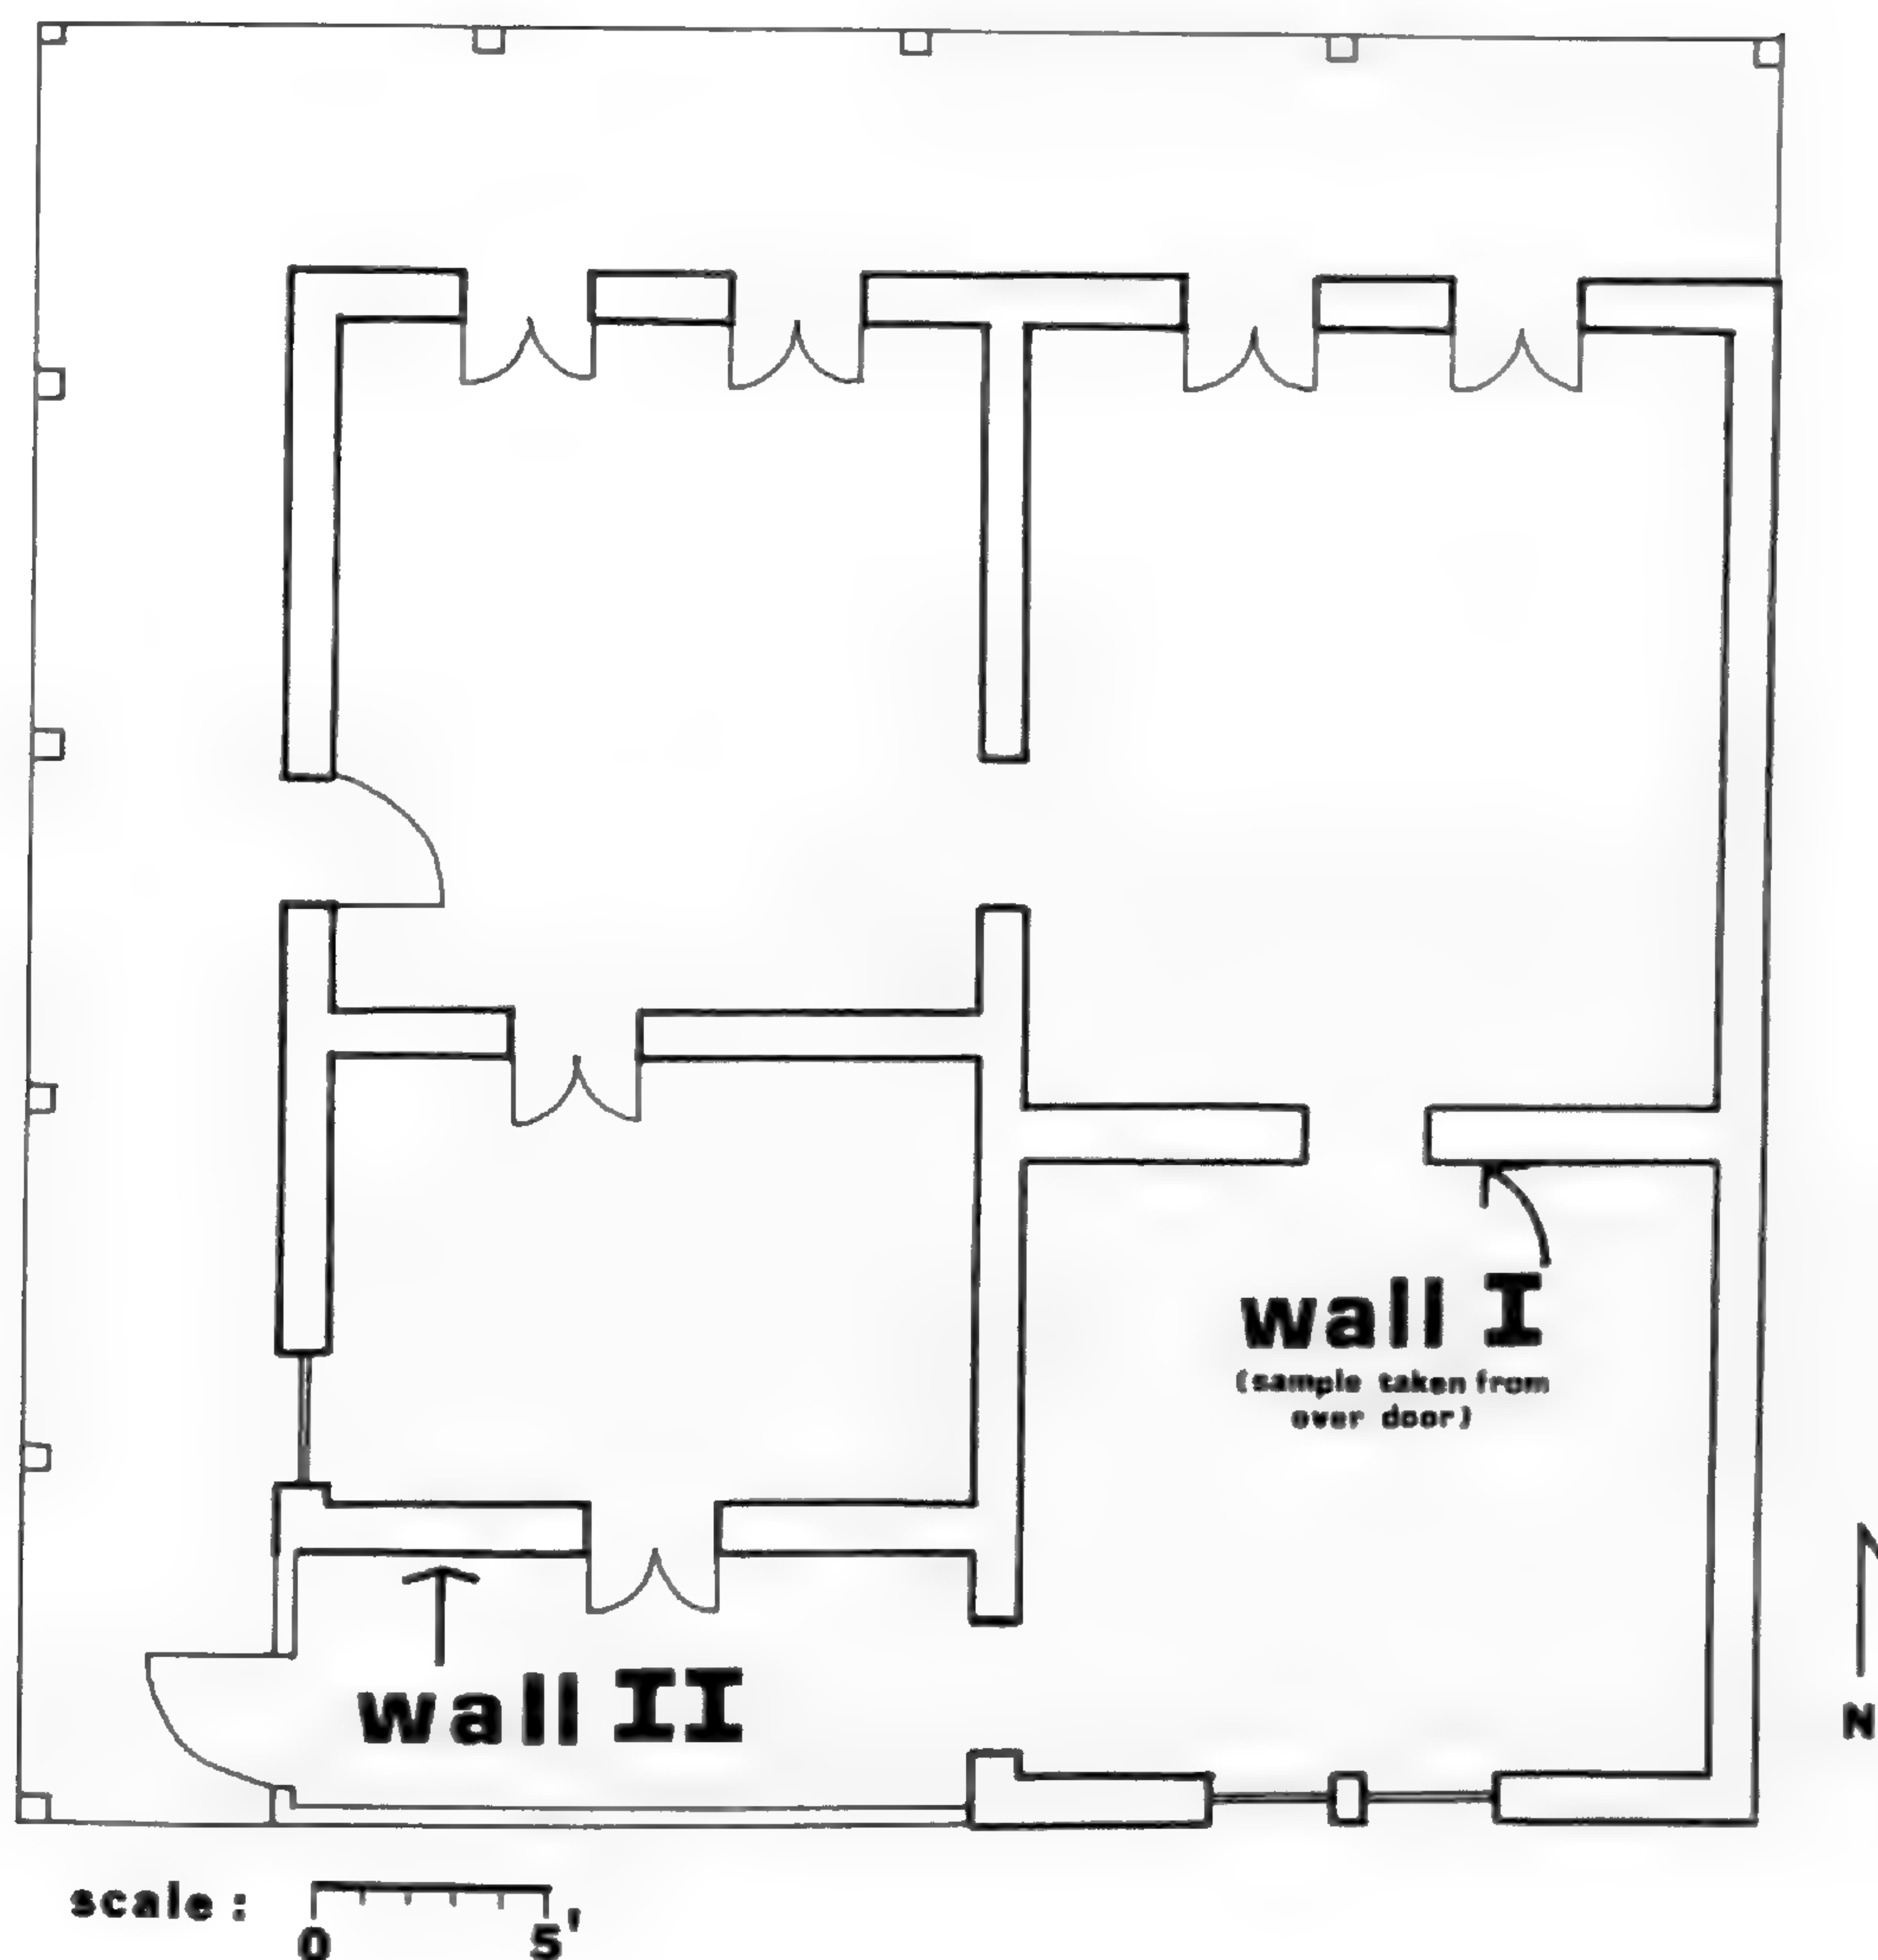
Floor plan of the Brockman House, Tucson, Arizona and locations where pollen samples were collected.
